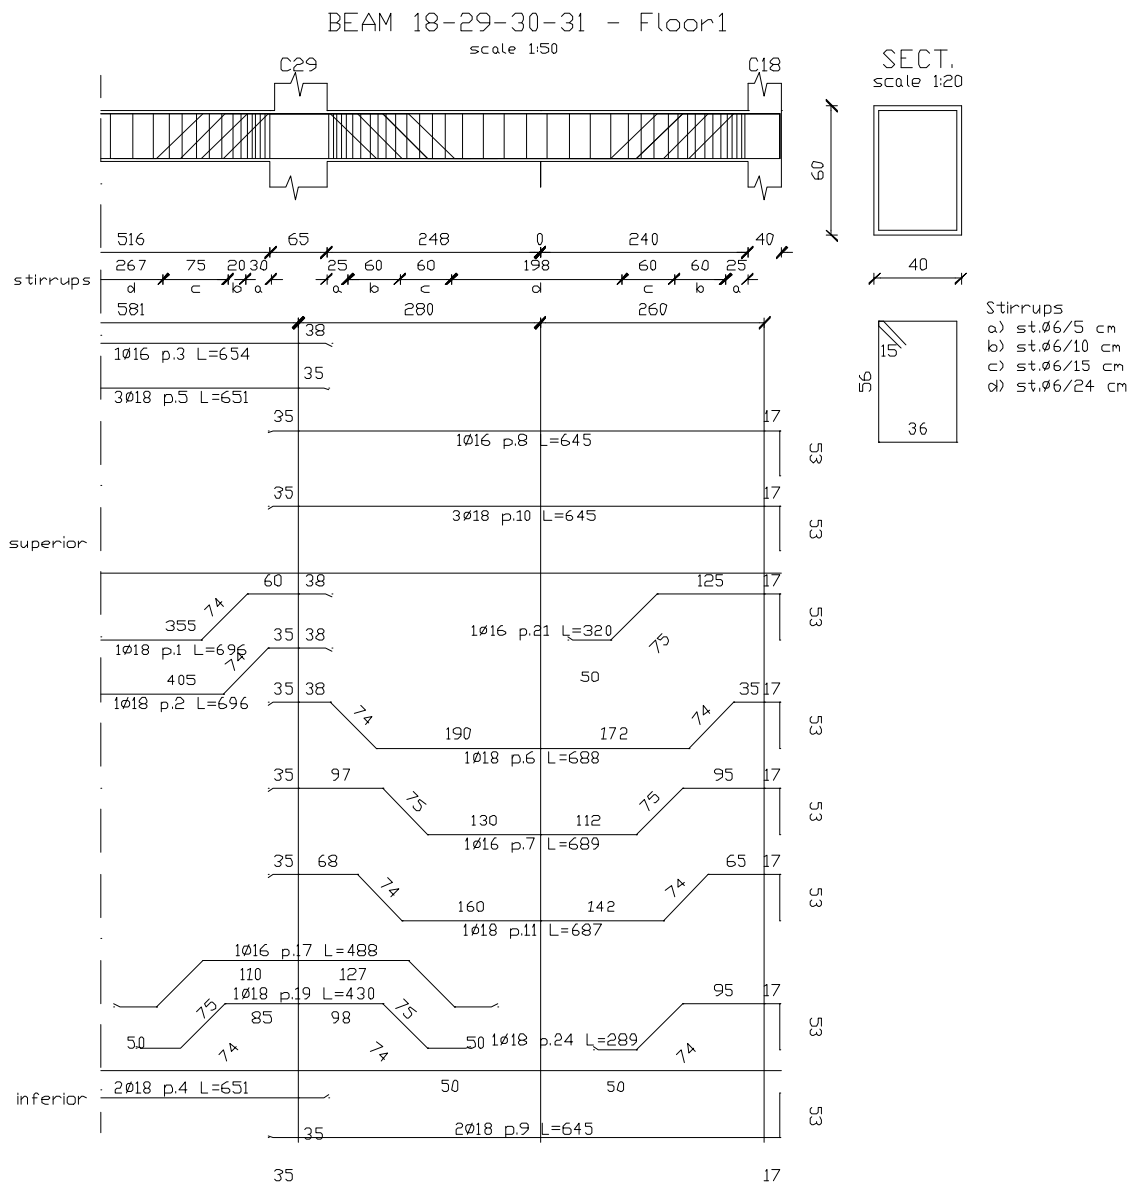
Detail of the reinforcement in beam 18-31 at first floor.
